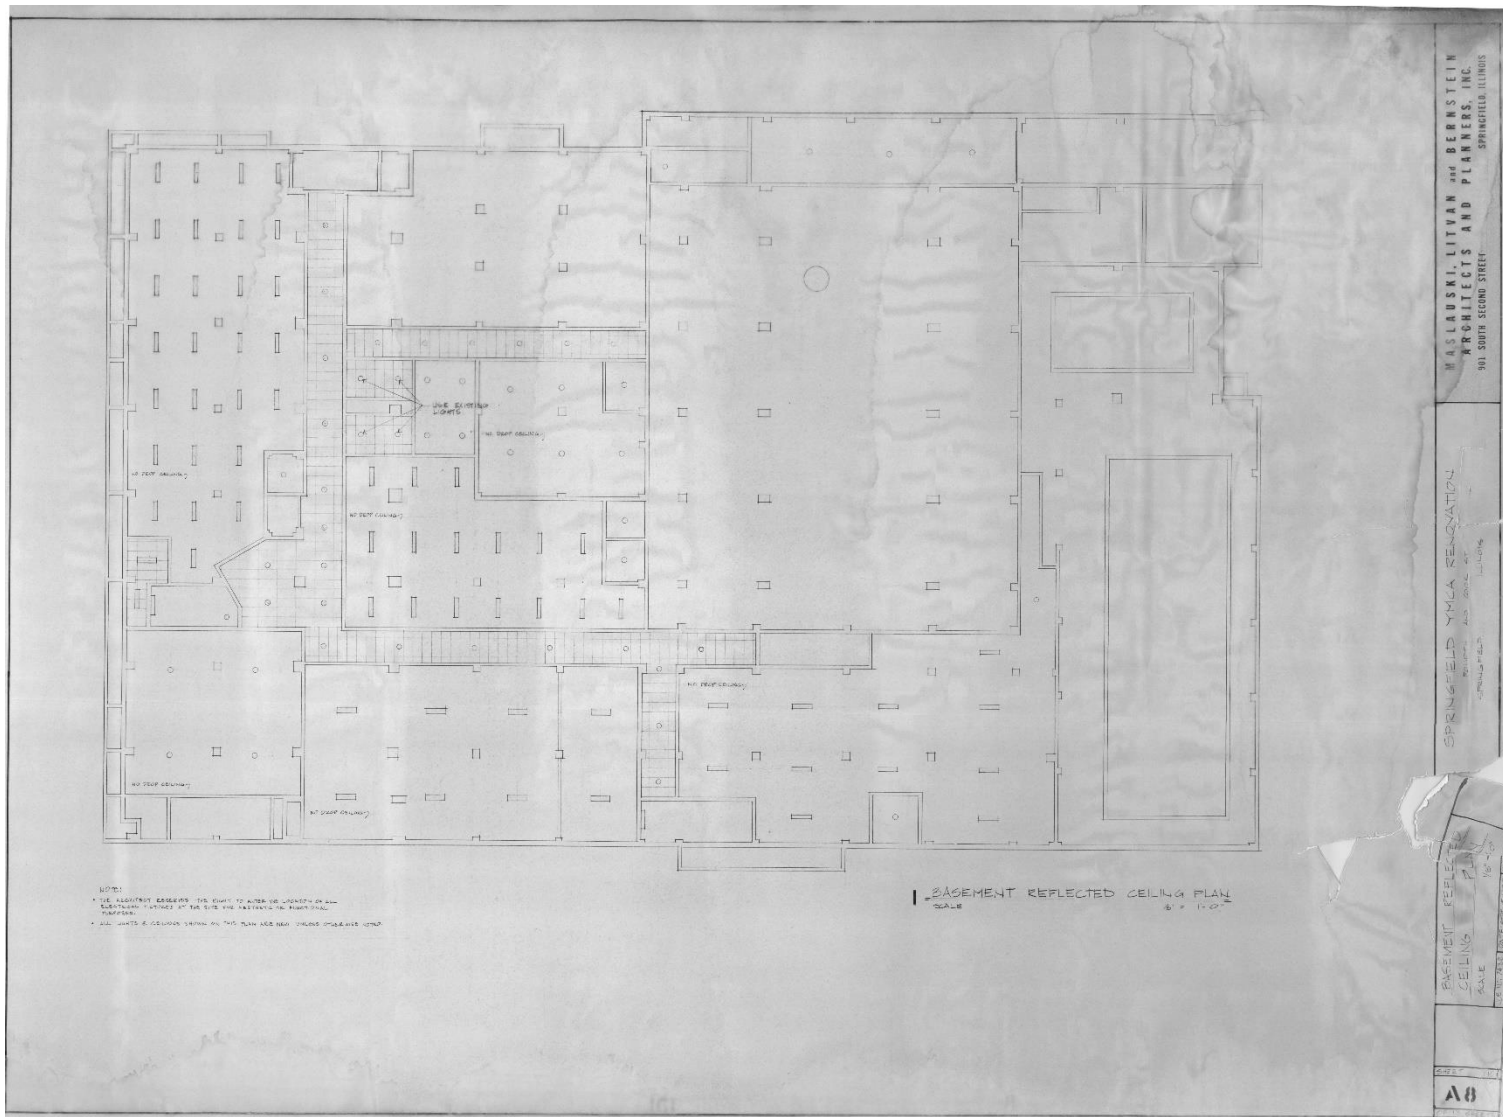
Basement Reflected Ceiling Plan, Springfield YMCA Renovation (Maslauski, Litvan and Berstein 1975: Sheet No. A8). [December 8, 1975].
